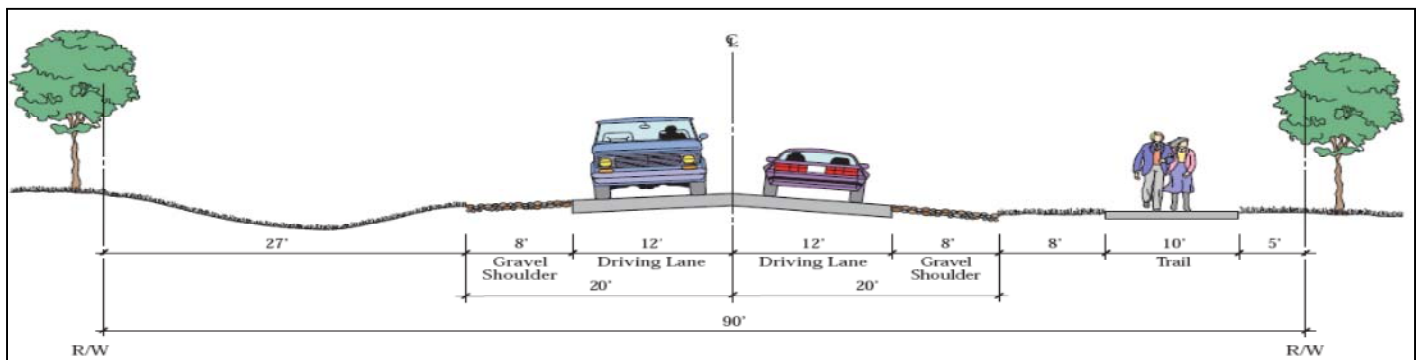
Two-Lane Minor Arterial/Major Collector Roadway Typical Section
